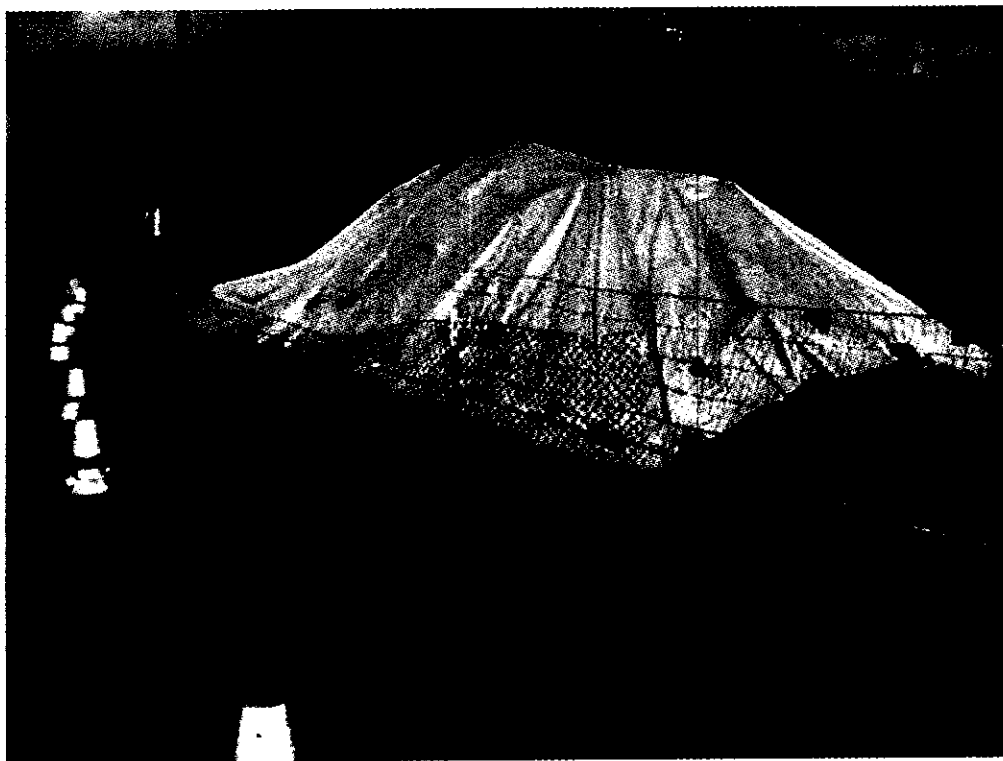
Stockpile at top of upper slope adjacent to DP Road, looking Northwest.
